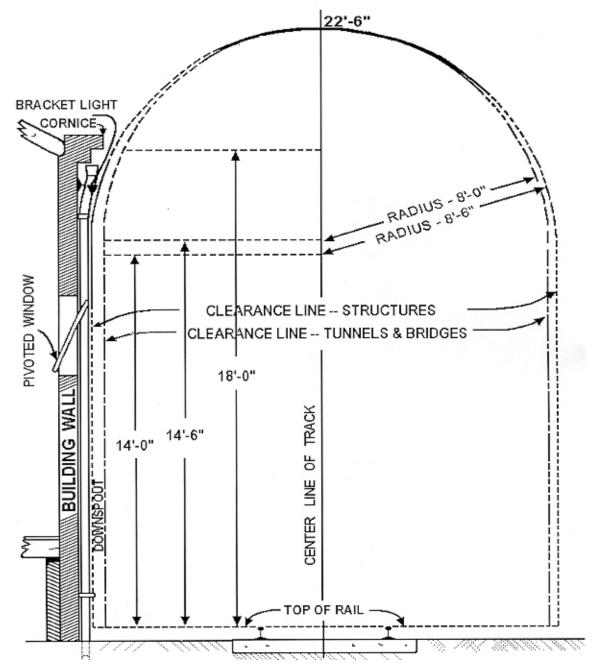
Minimum Overhead Clearances for Buildings, Structures, Tunnels, and Bridges
